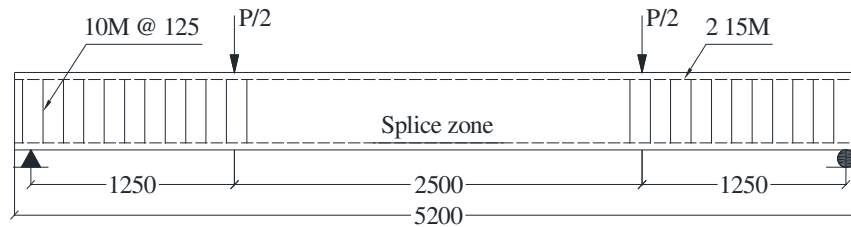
Details of the geometry and transverse reinforcement of the test beams [Note: 1 mm=0.0394 in.]
